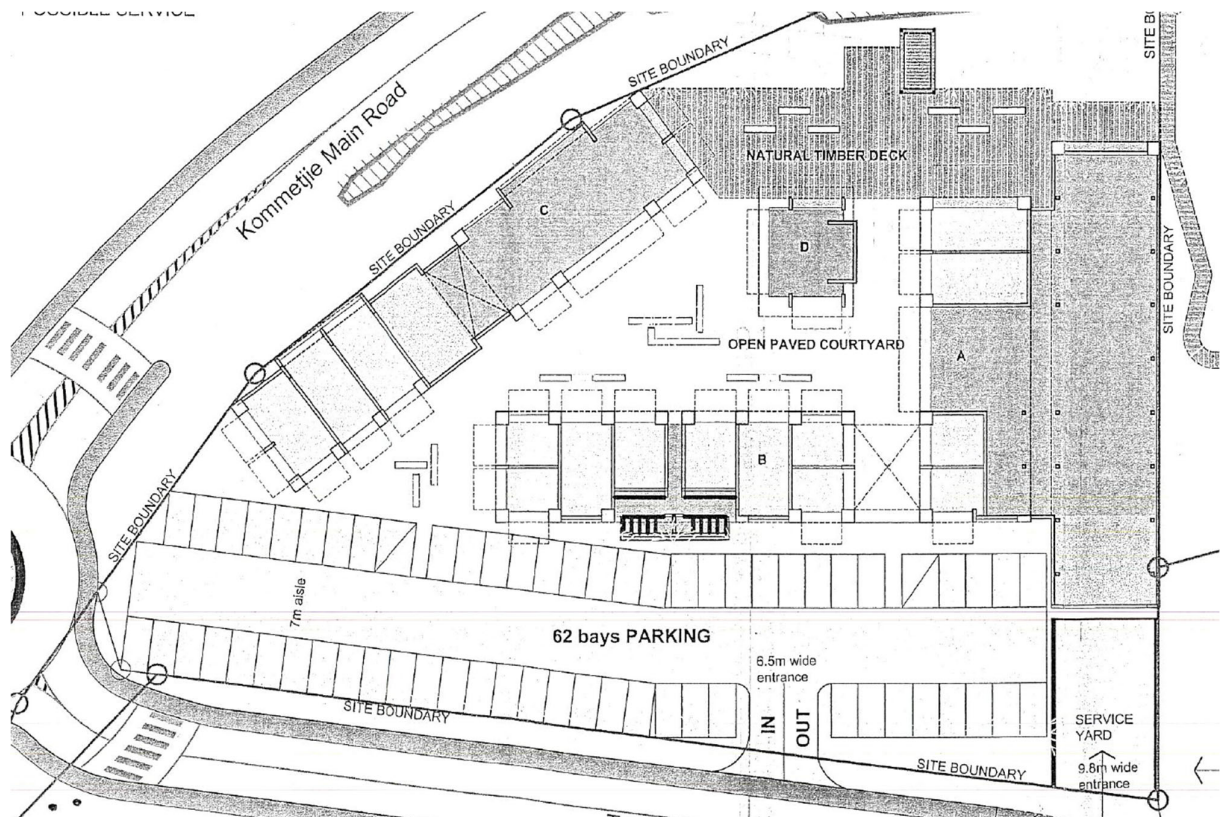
Plan resulting in the 2017 approval, showing parking along Teubes and Kommetjie Main Road
